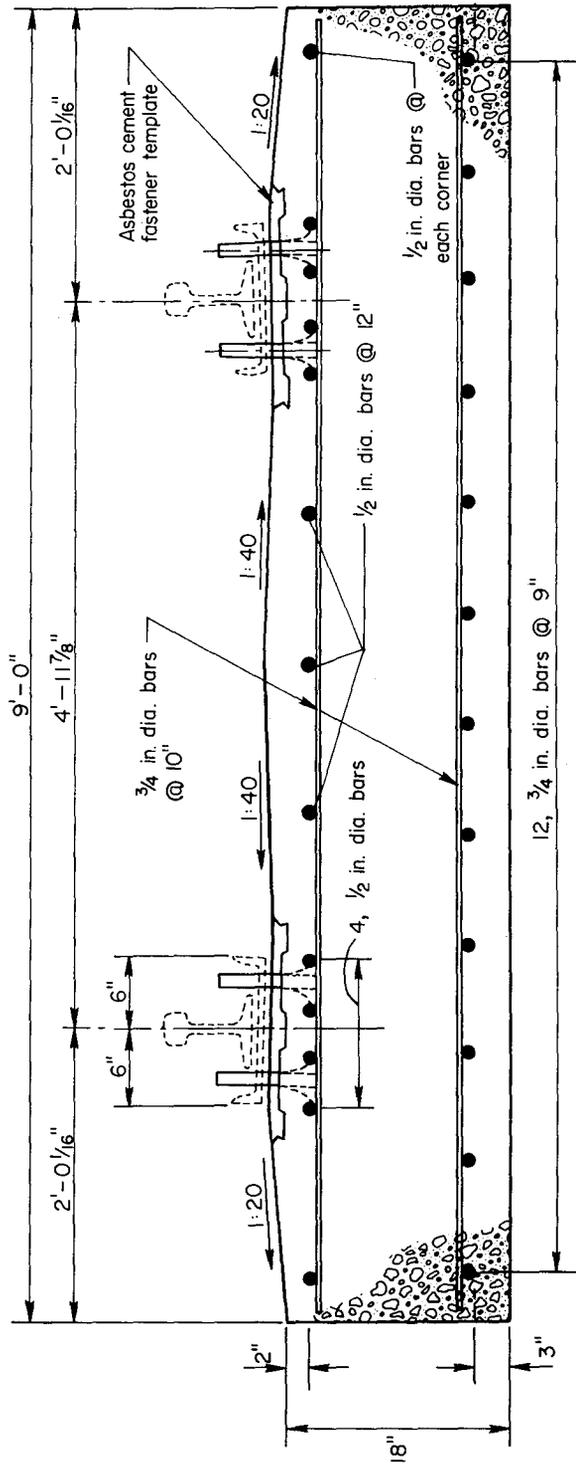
CROSS SECTION OF SLAB TRACK ON THE KANSAS TEST TRACK
